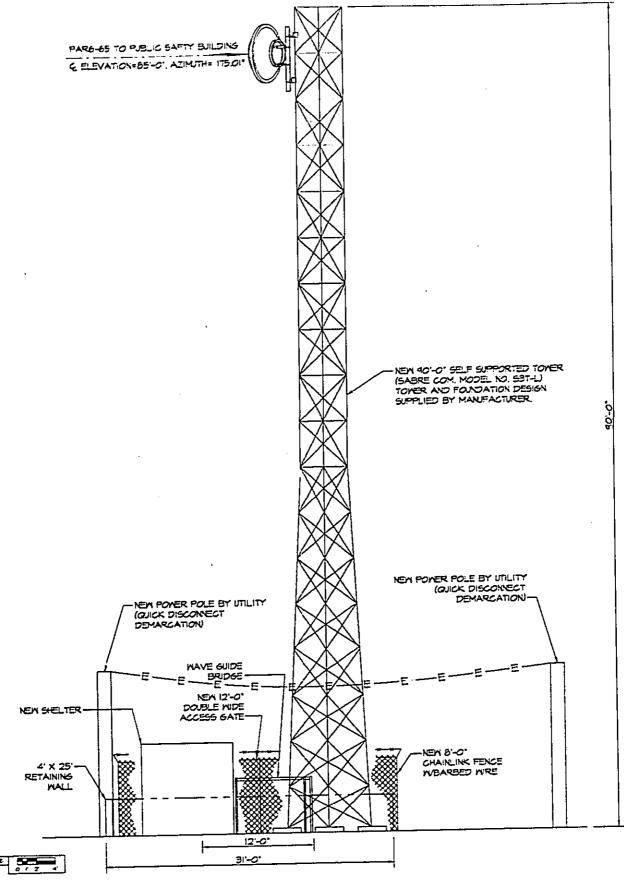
E Fire Central / Elevation Plan (looking southwest)
